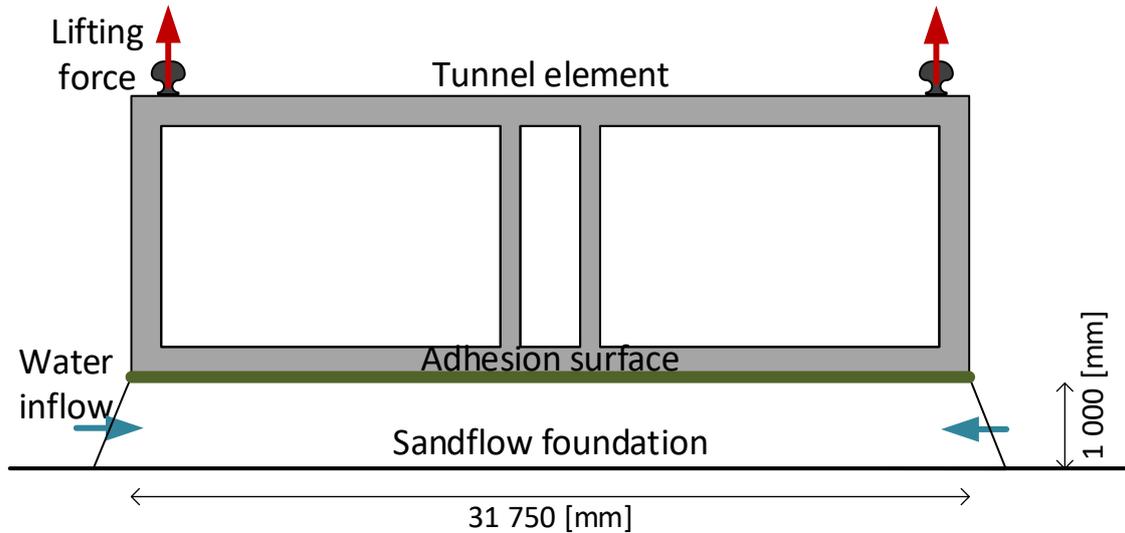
, SOIL ADHESION SITUATION SKETCH; CROSS SECTIONAL VIEW
